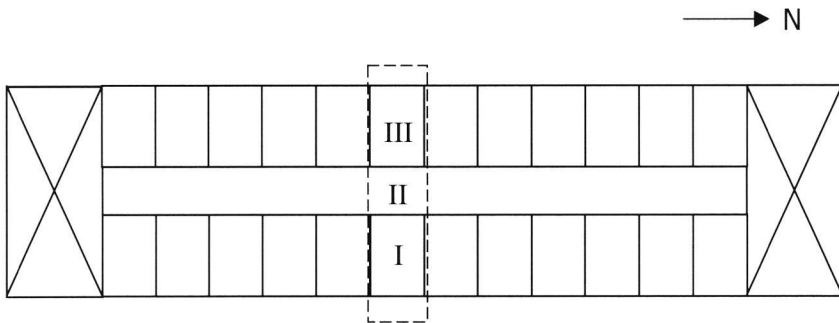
Plan of the top floor. A corridor separates the two rows of office spaces at the long façades. The crosses at both ends of the building indicate the stairwells, which are separated from the corridors by airtight fire doors. The orientation of the building is indicated. The dashed rectangle encloses the part of the building that is modeled in detail.
